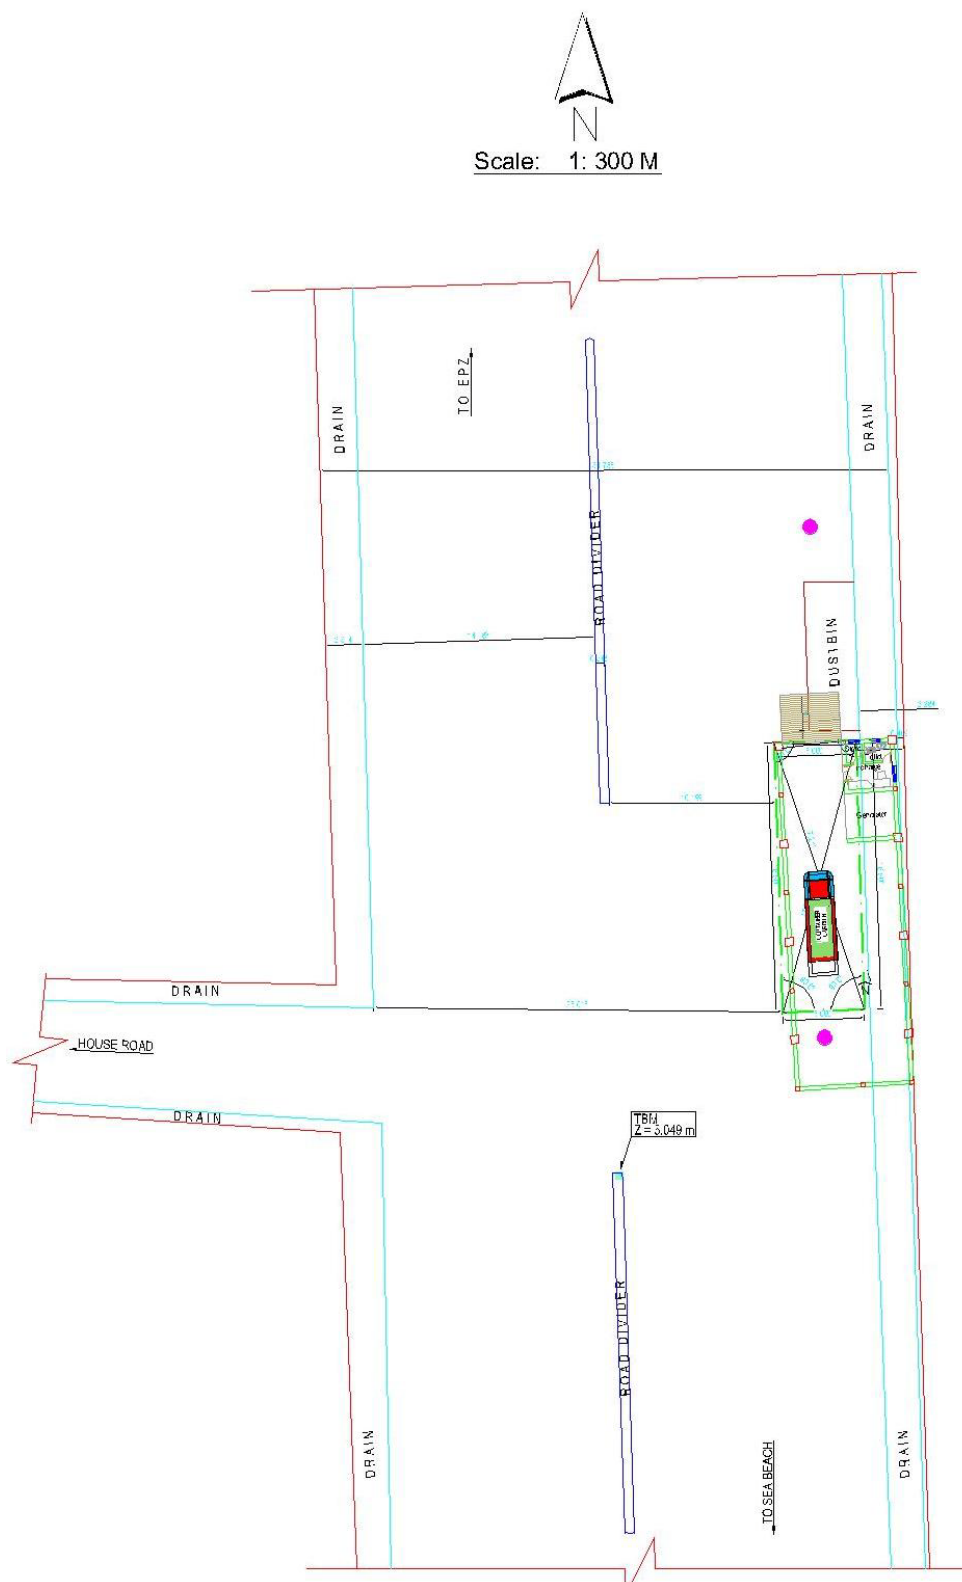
STS – 10 Mohazonghata Road Layout Plan (22°19'23"N, 91°47'40"E)
